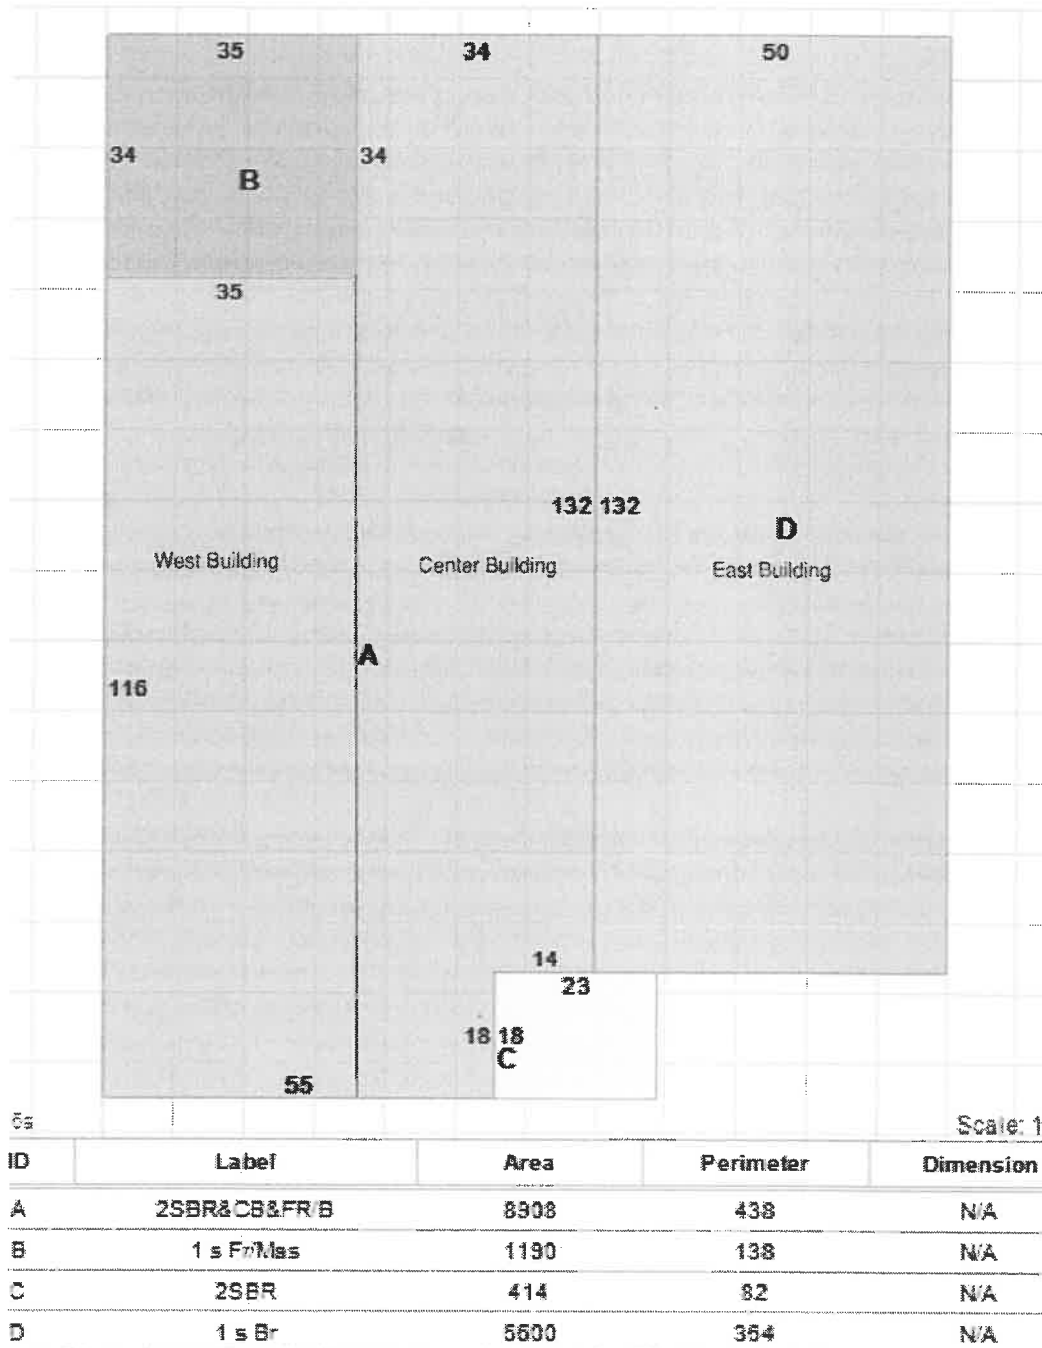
Approximate Building Size/Layout provided by the Hamilton County Auditor.
